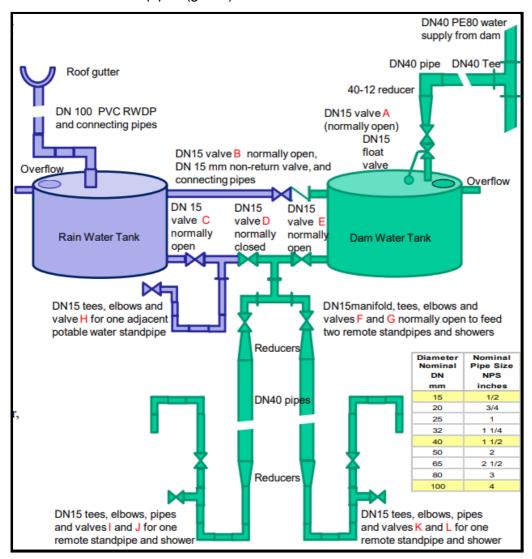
A typical roof drainage and rainwater tank collection system arrangement.
